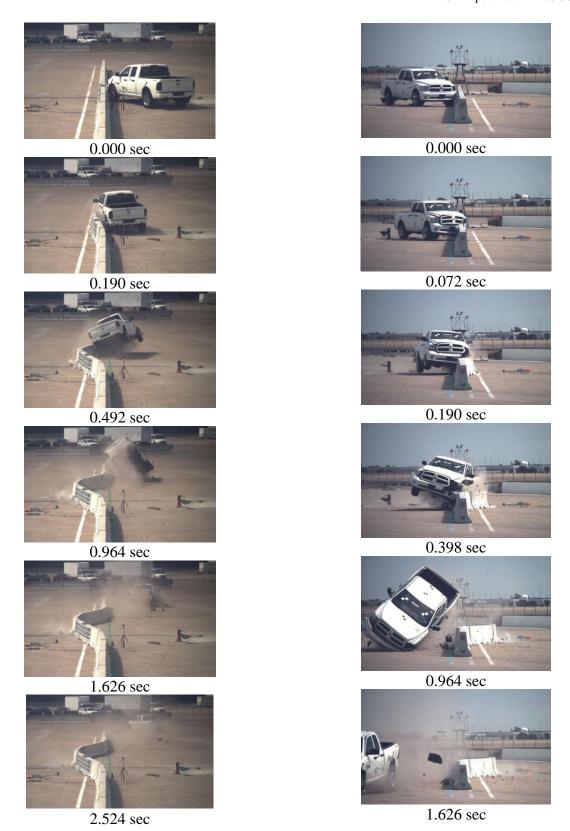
Additional Sequential Photographs, Test No. GSH-2
